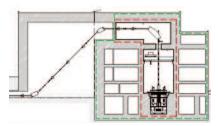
MYRRHA building vertical cut with beam line entrance picture to be added (Source: MYRRHA Consortium)
